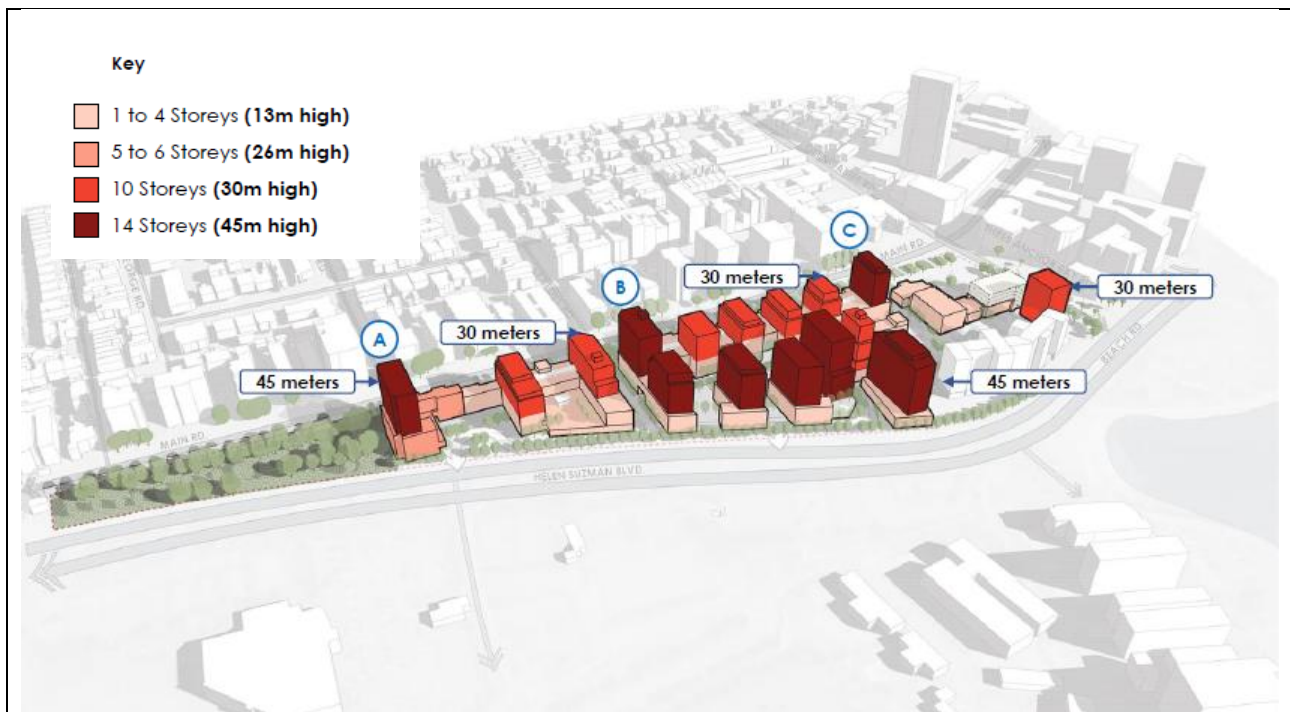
Proposed building heights associated with the concept design (ACG architects)
